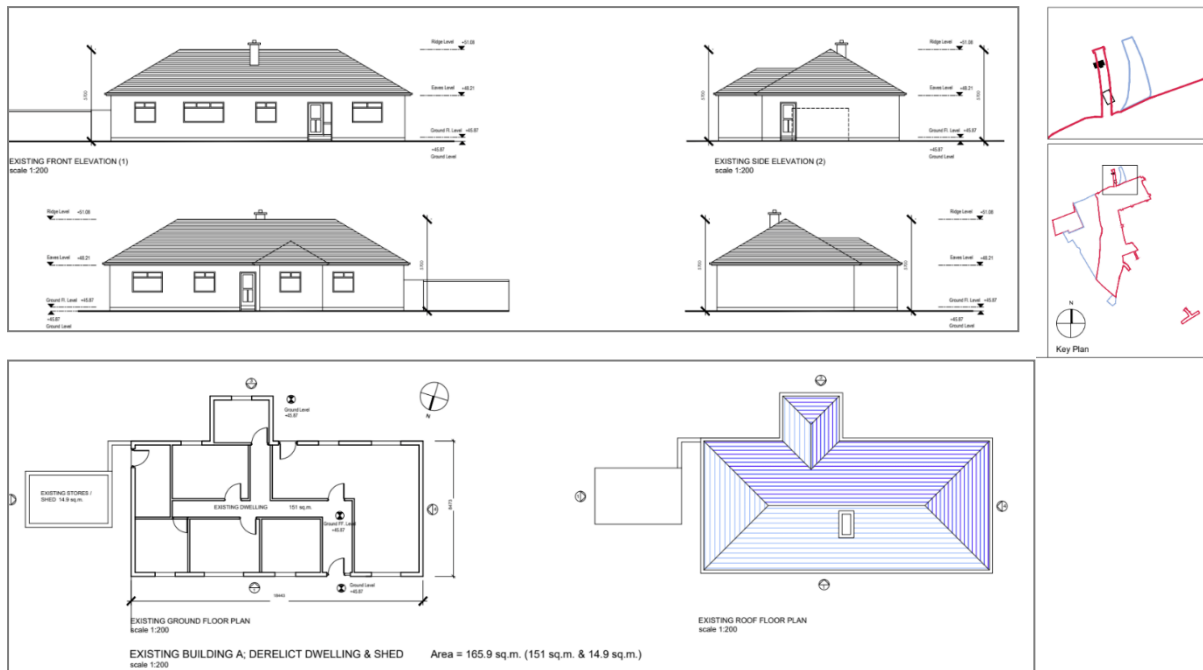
Drawing extracts showing the existing dwelling located off Flemington Lane which is proposed for demolition.
